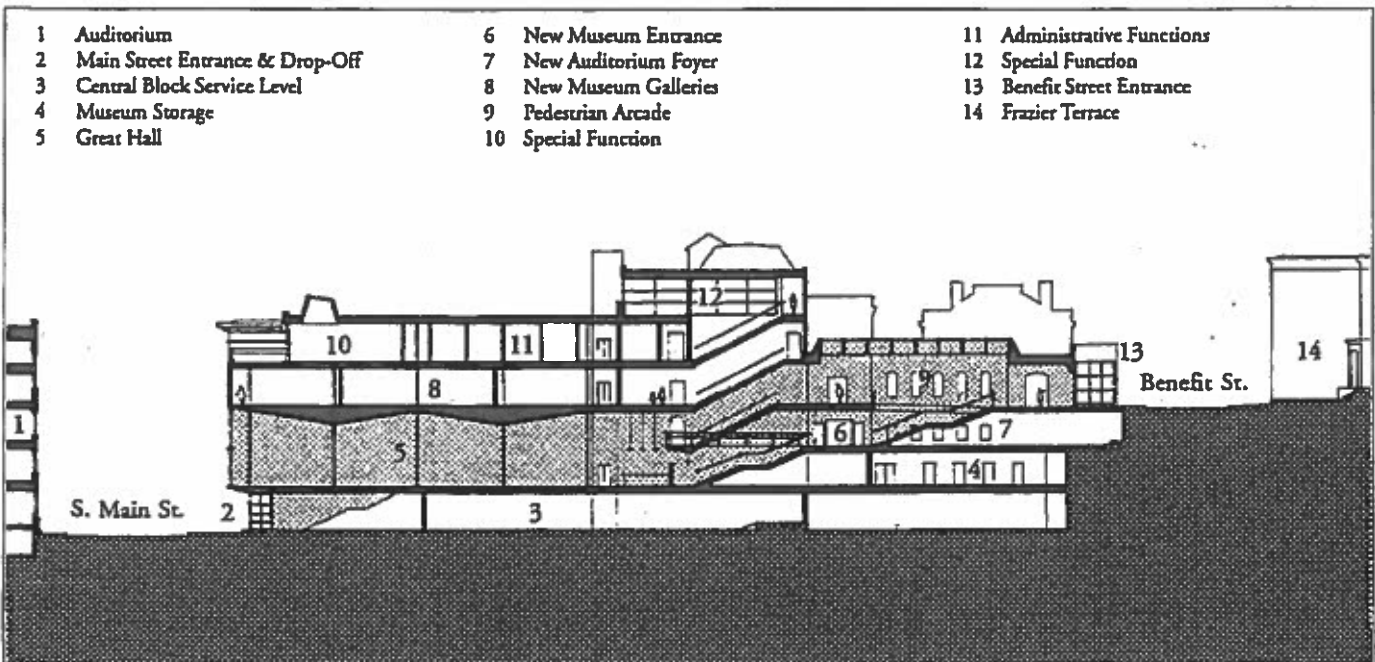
Concept section through "Great Hall" connecting Main Street (downhill), Benefit Street (uphill), and Museum entrance (center)
